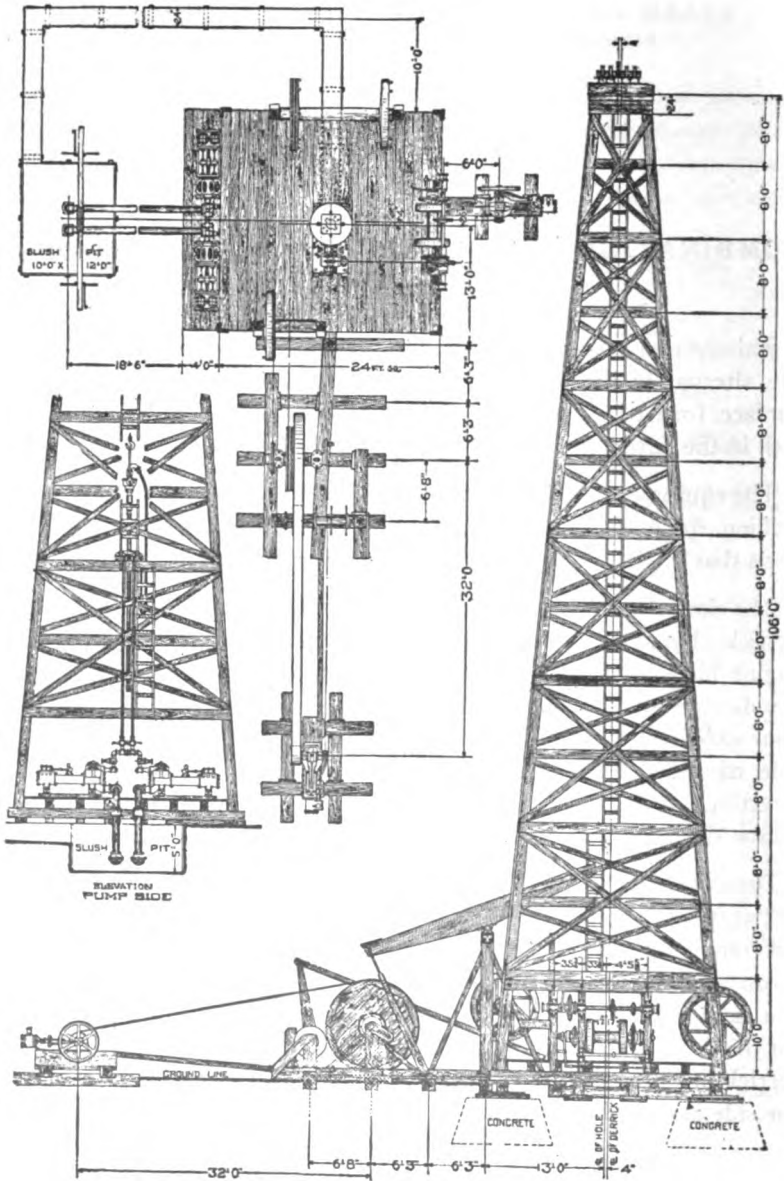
Side elevation and ground plan of 106-foot California Combination Rotary and Cable Drilling Rig with extra wind braces, showing machinery installed ready for drilling.
